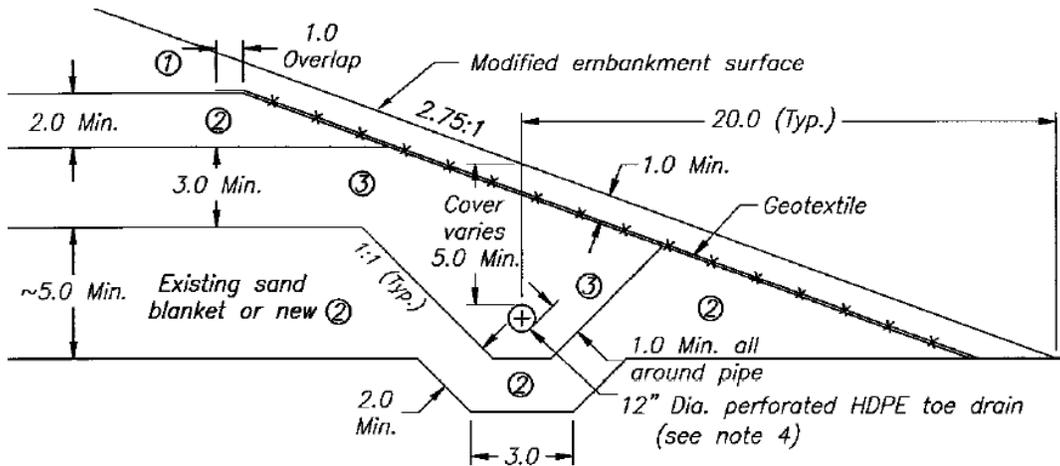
Cross section showing toe drain detail with geotextile separating zone 1 from the zone 2 sand and the zone 3 gravel.
